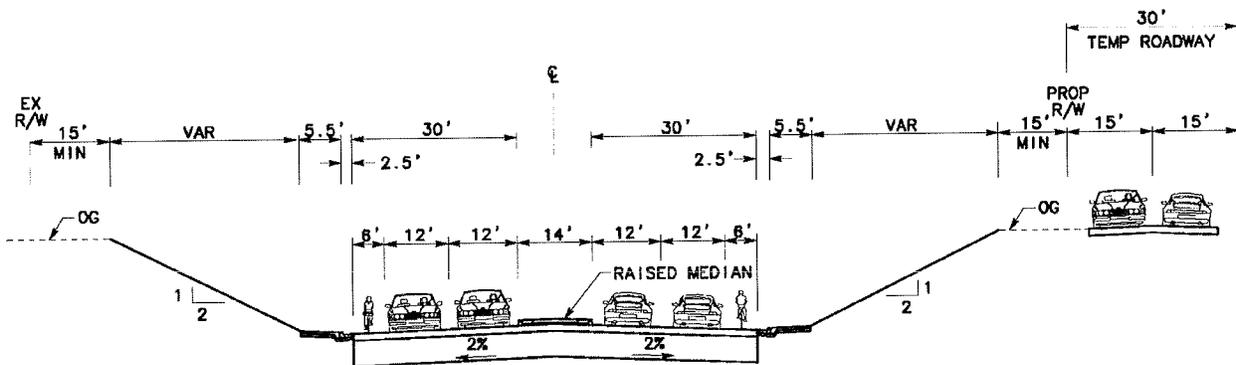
Alternative 4 – Underpass with Side Slopes (Looking East)
